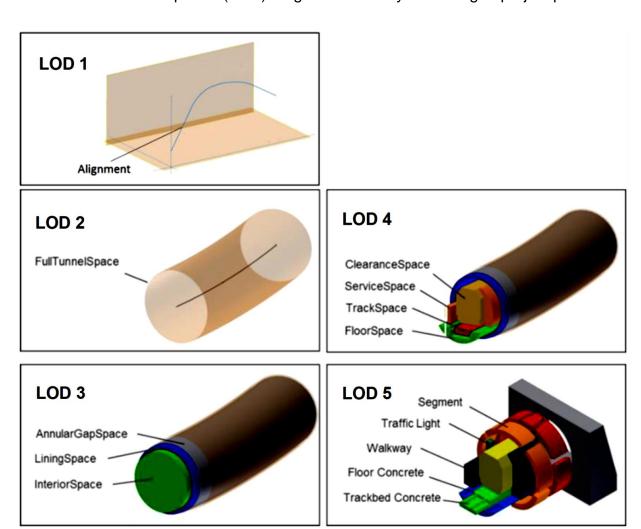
Illustration of LoD for a tunnel excavated with tunnel boring machine (DVW, 2019)
